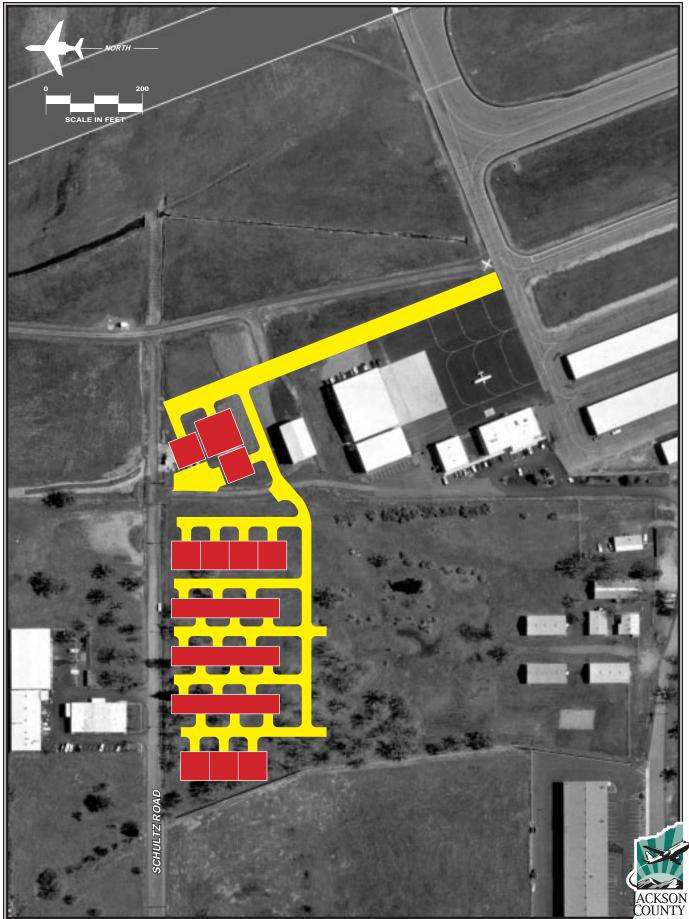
G PROPOSED HANGAR FACILITIES-SCHULTZ ROAD
